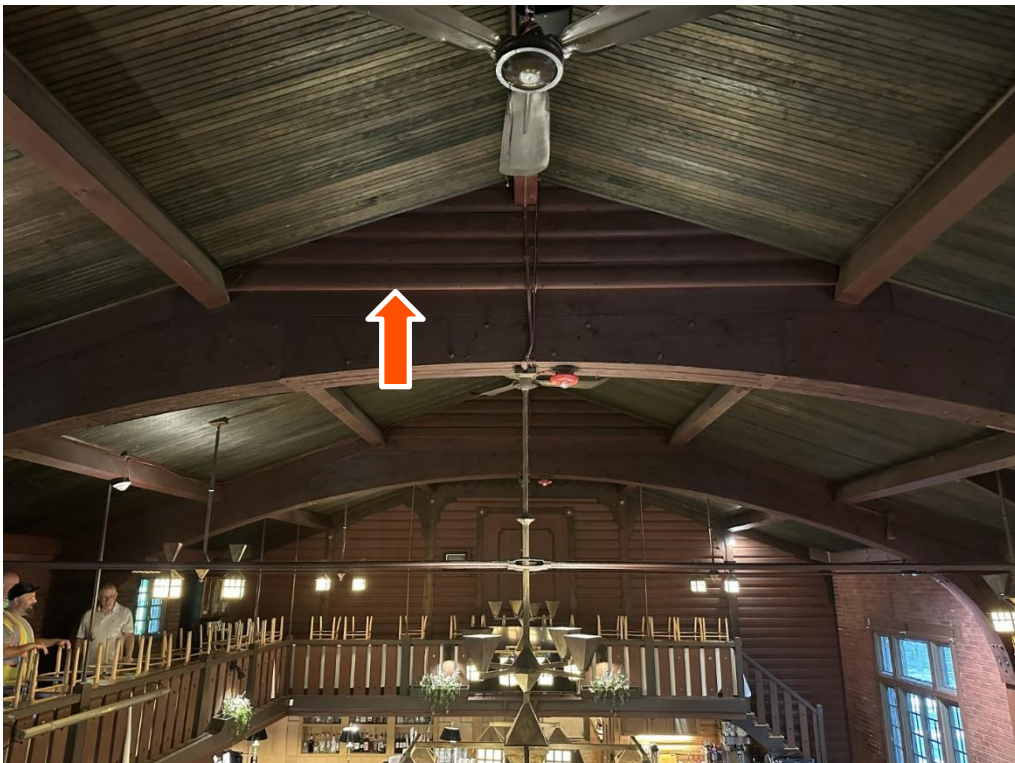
Public hall roof framing. Arrow indicates infill wall above center girder segment
